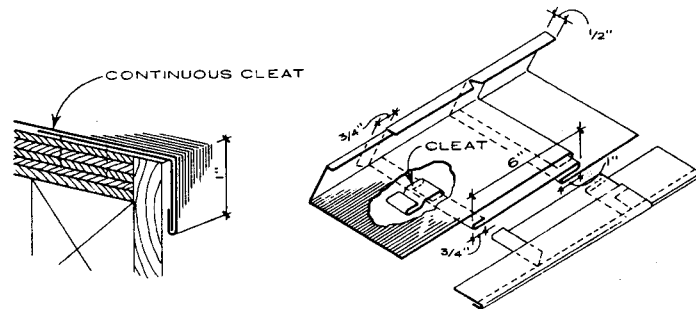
SEAM TYPES AT HIP OR RIDGE
